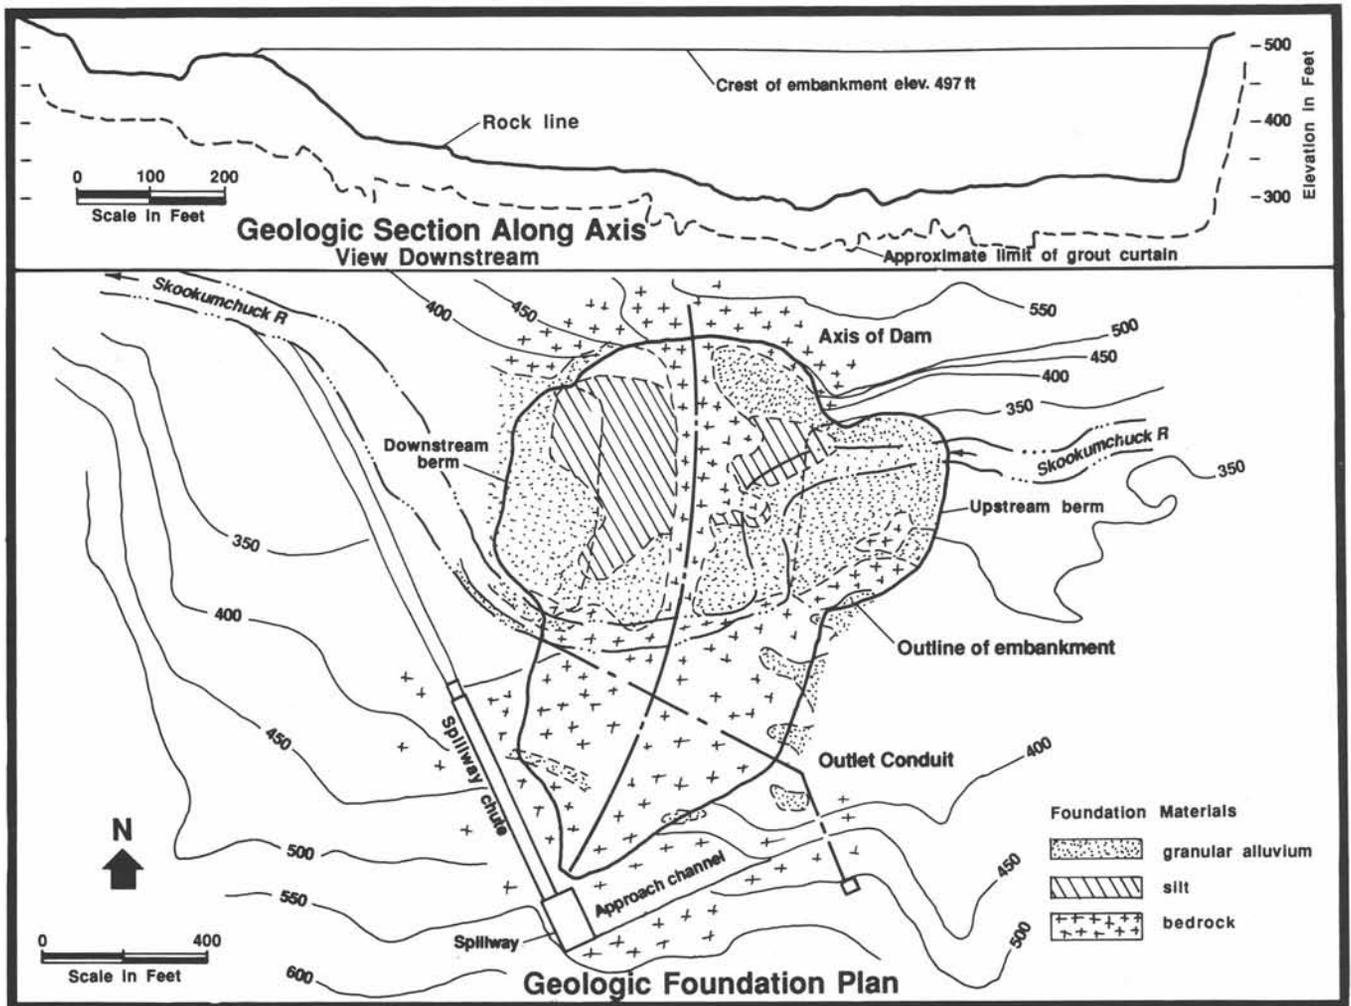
Geologic section along axis and centerline of grout curtain and foundation plan at Skookumchuck Dam. After Bechtel Corporation (1971).
